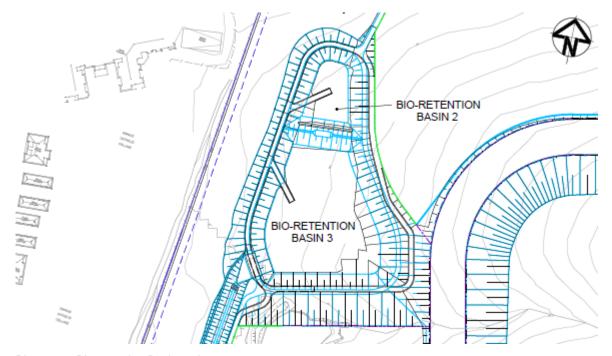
SSDA approved basins layout with overlaid proposed MOD 1 basin layout
